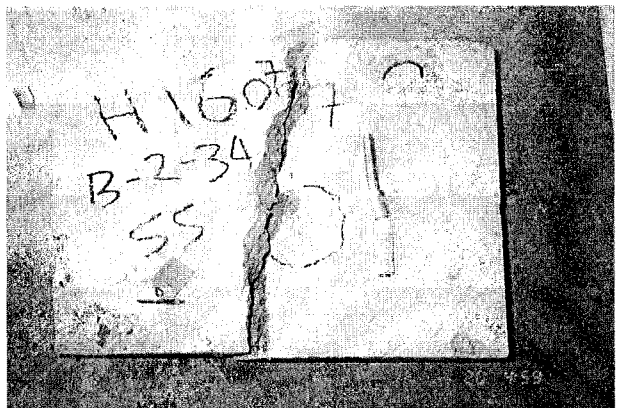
Typical Failure Mode F - Bearing failure then block failure: split or wedge
